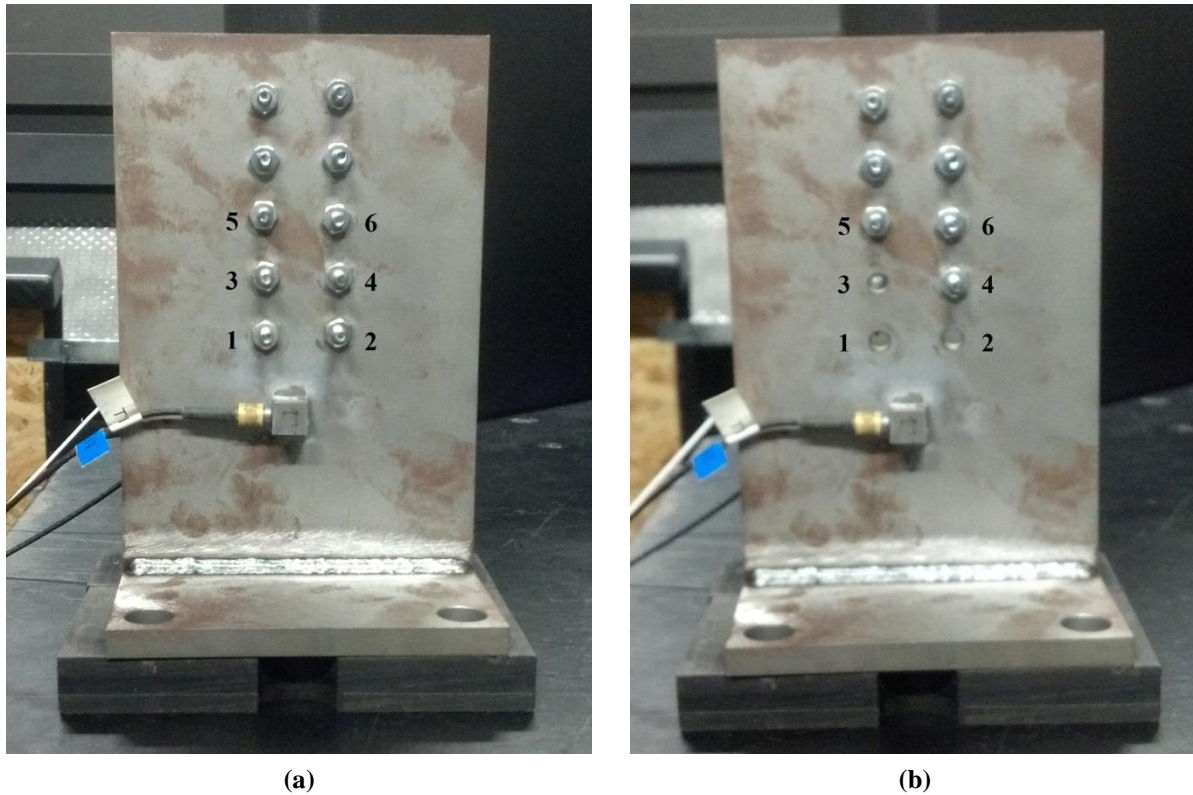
Connection specimen bolt removal plan: (a) damage scenario D0 (b) damage scenario D3
